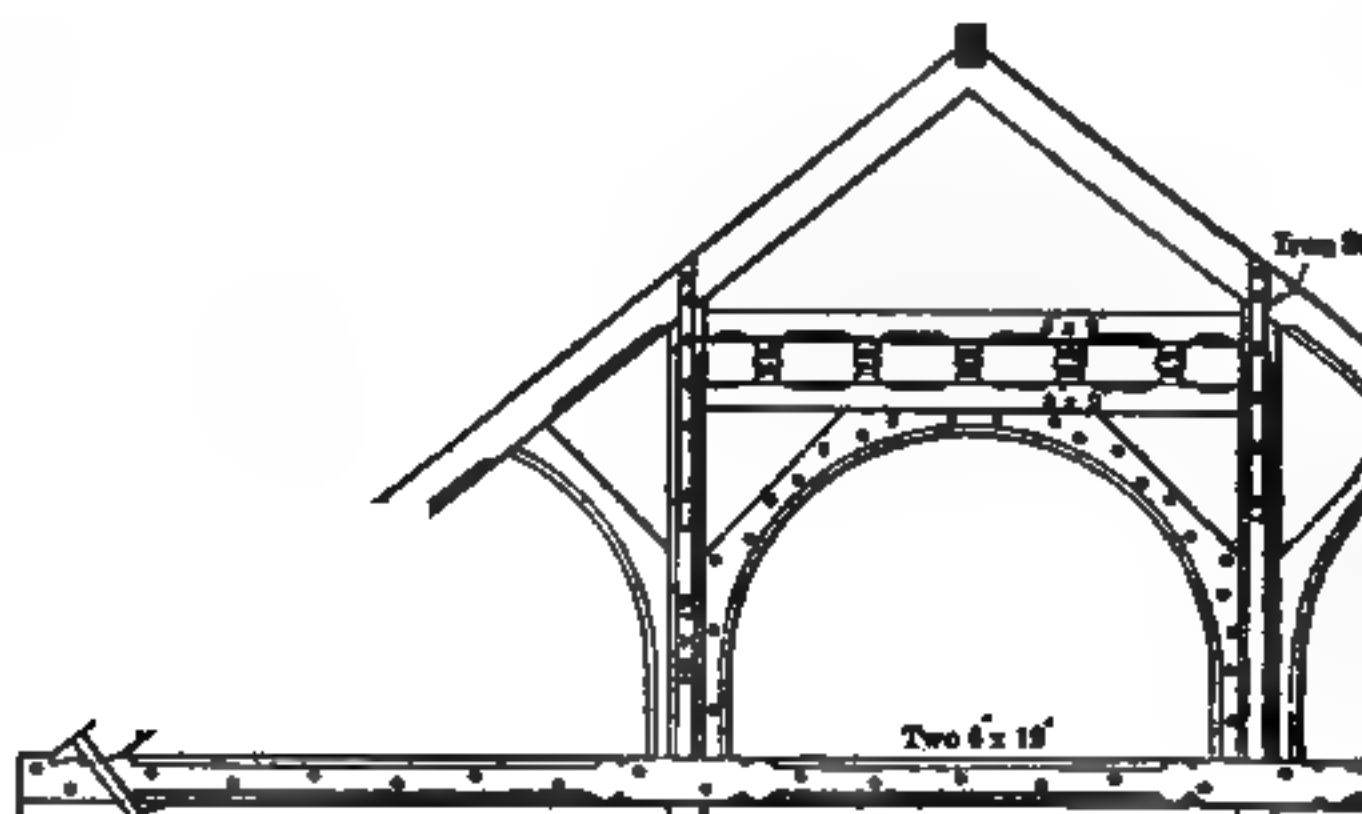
Queen-post Truss. Massachusetts Charitable Mechanics' Association Building, Boston, Mass.
